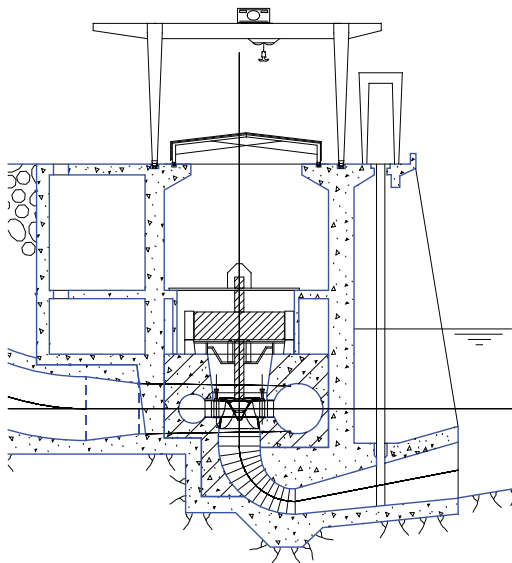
Semi-Outdoor Powerhouse – typical cross-section.
